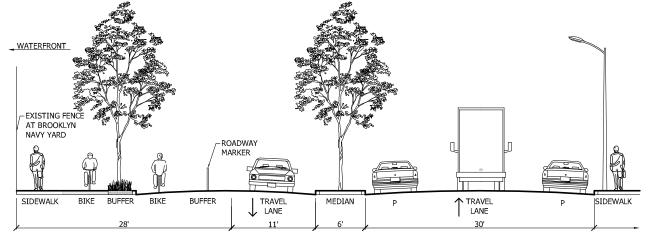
Possible Configuration for Kent Avenue South at Navy Yard - Reprogram Parking Space as Bike Lane
